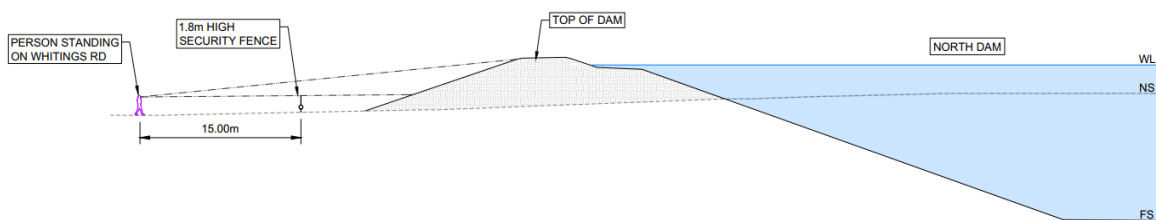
Cross Section Drawings – Water Storage Facilities
